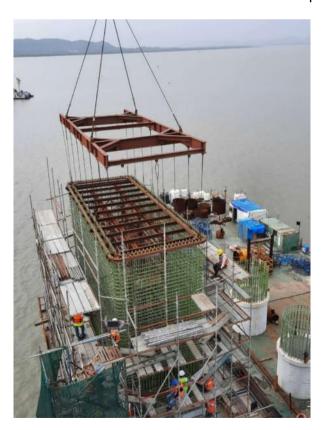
MP 125 3rd Lift Pier Prefab Reinforcement at Marine Section in progress
